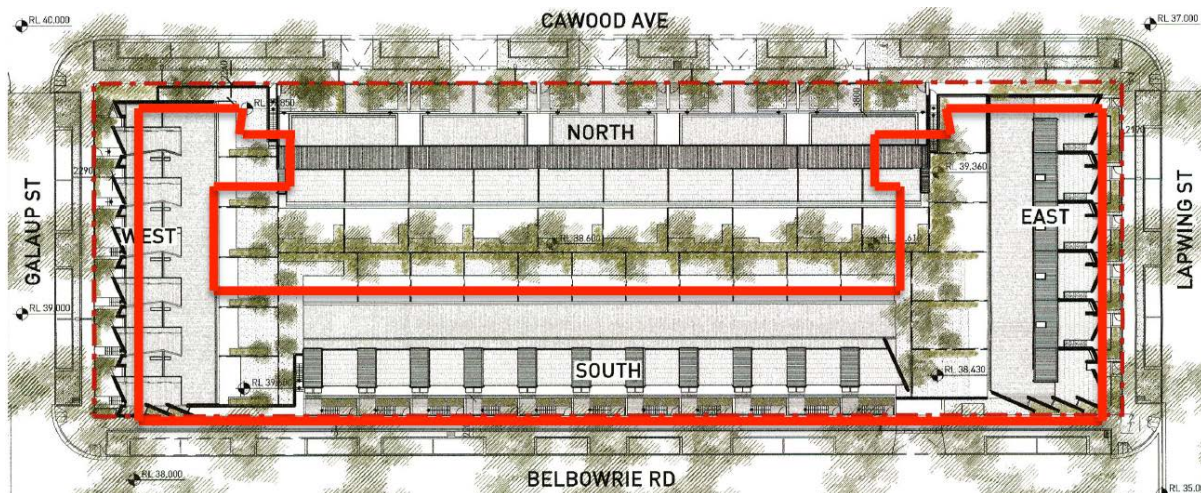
Site plan showing bounded in red the general location of the basement level underneath.
